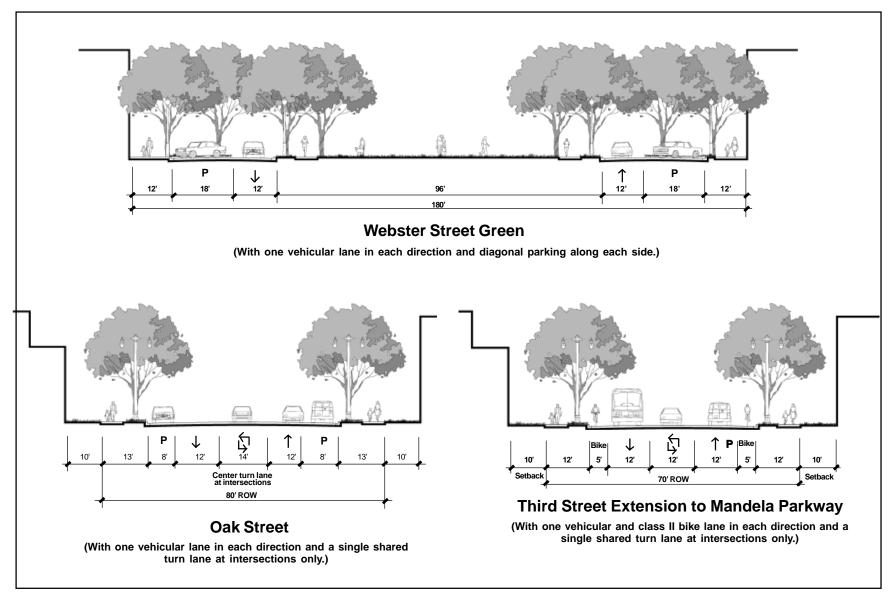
Jack London District Illustrative Street Cross Sections
